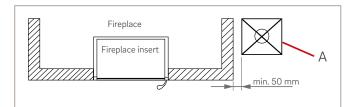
Protection and distances with heated surfaces, Lina, Lina TV
